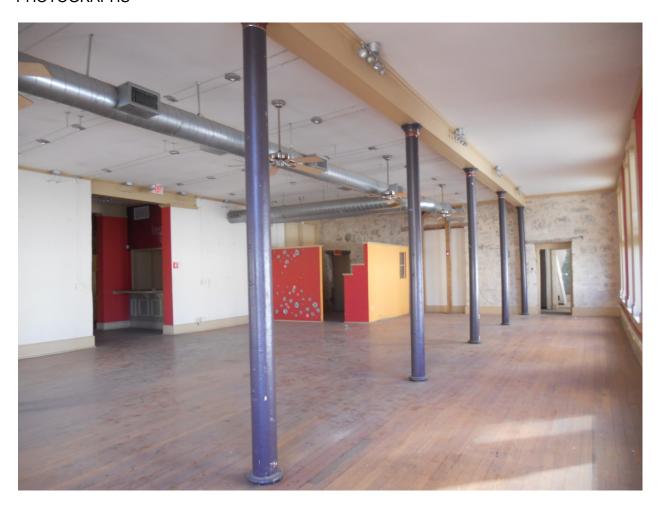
Second Floor Soledad Block Looking Southeast Feb. 24, 2016
